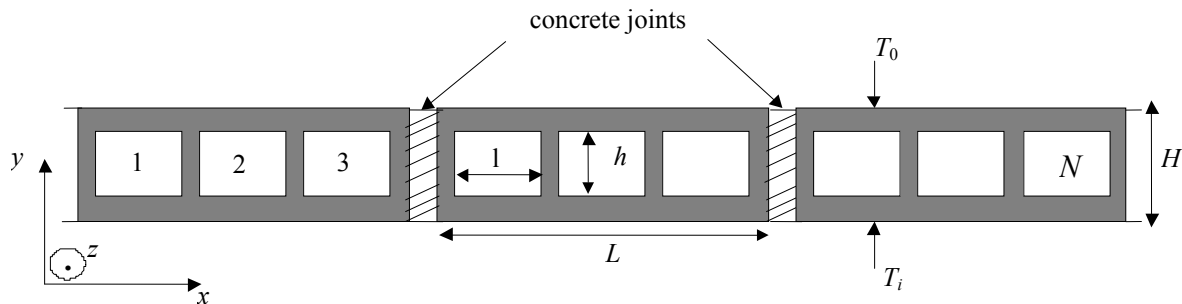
Schematic diagram of disposition of hollow blocks in building roofs
